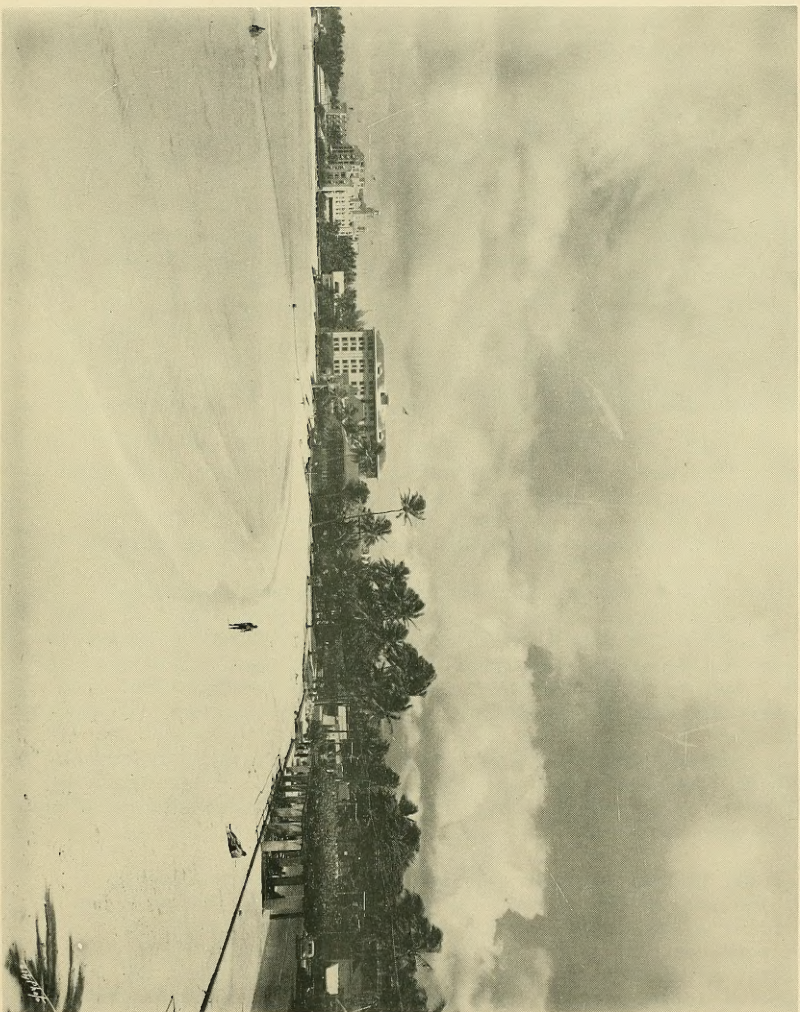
AFTER CONSTRUCTION OF SUBMERGED BREAKWATER AND ARTIFICIAL
